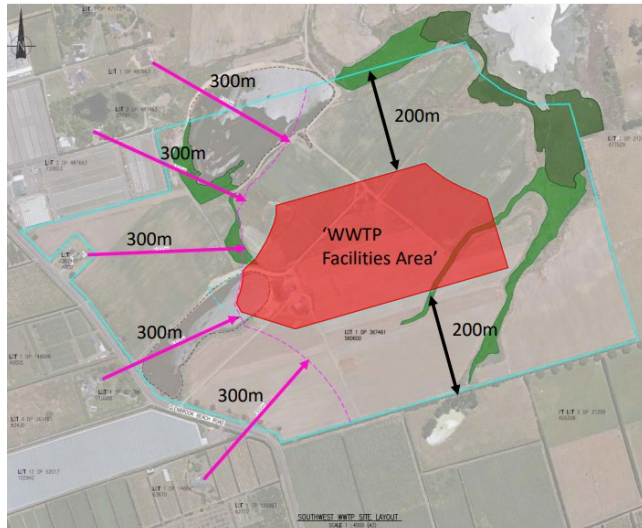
Separation distances between site boundary and dwellings to the facilities area (extracted from Air Quality Assessment)
